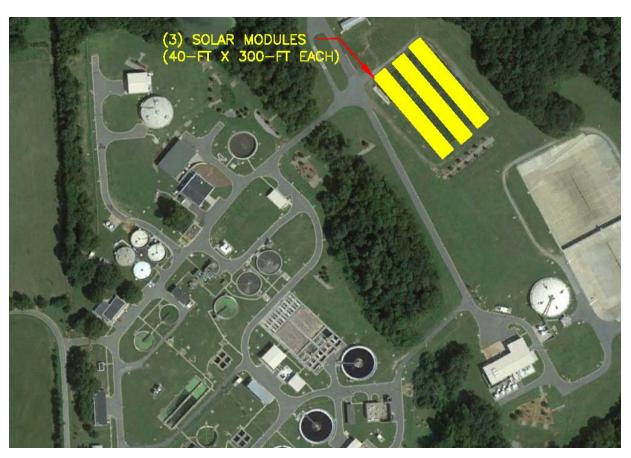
Alternative 4-12 McDowell Creek WRF Site Layout
